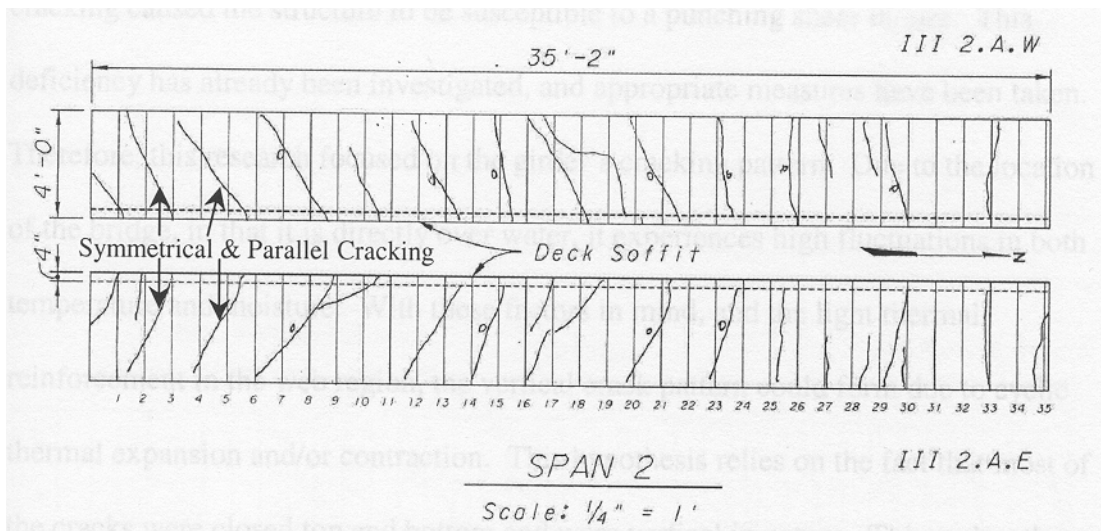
Schematic of crack patterns in a typical girder (Center Girder of Span 2 from Pier 2 to Mid Span)
